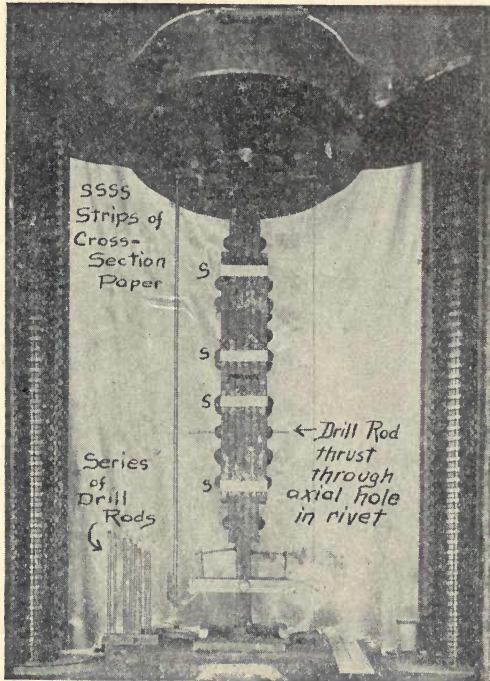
VIEW OF TENSION TEST PIECE WITH AUXILIARY APPARATUS FOR MEASURING DEFORMATION.
